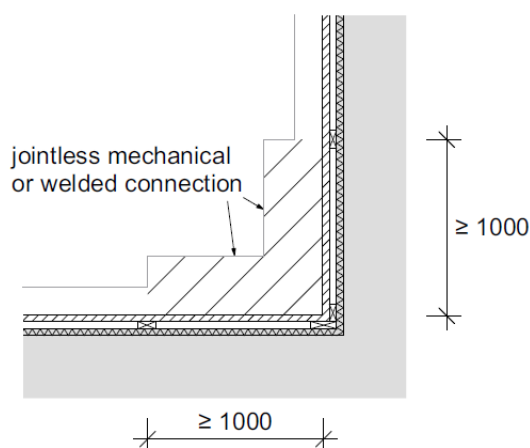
Representation of the fire stops in the inner corner with jointless mechanical or welded connection (hatching).
